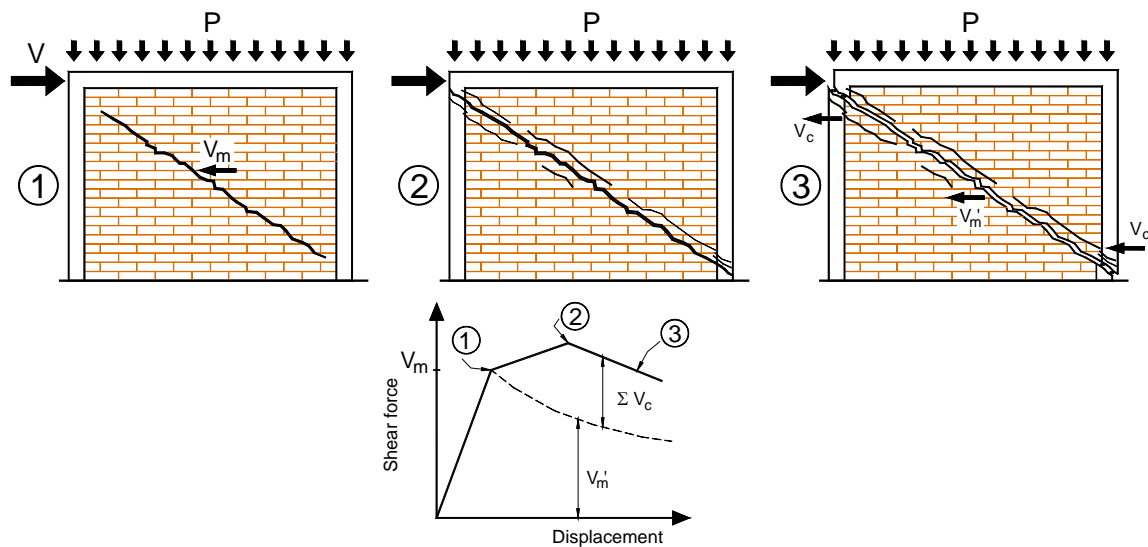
Mechanism of shear resistance for a confined masonry wall panel: 1) diagonal cracking in the masonry wall; 2) diagonal cracks have propagated from the wall into the tie-columns, and 3) shear failure of the RC tie-columns and the confined masonry wall panel
